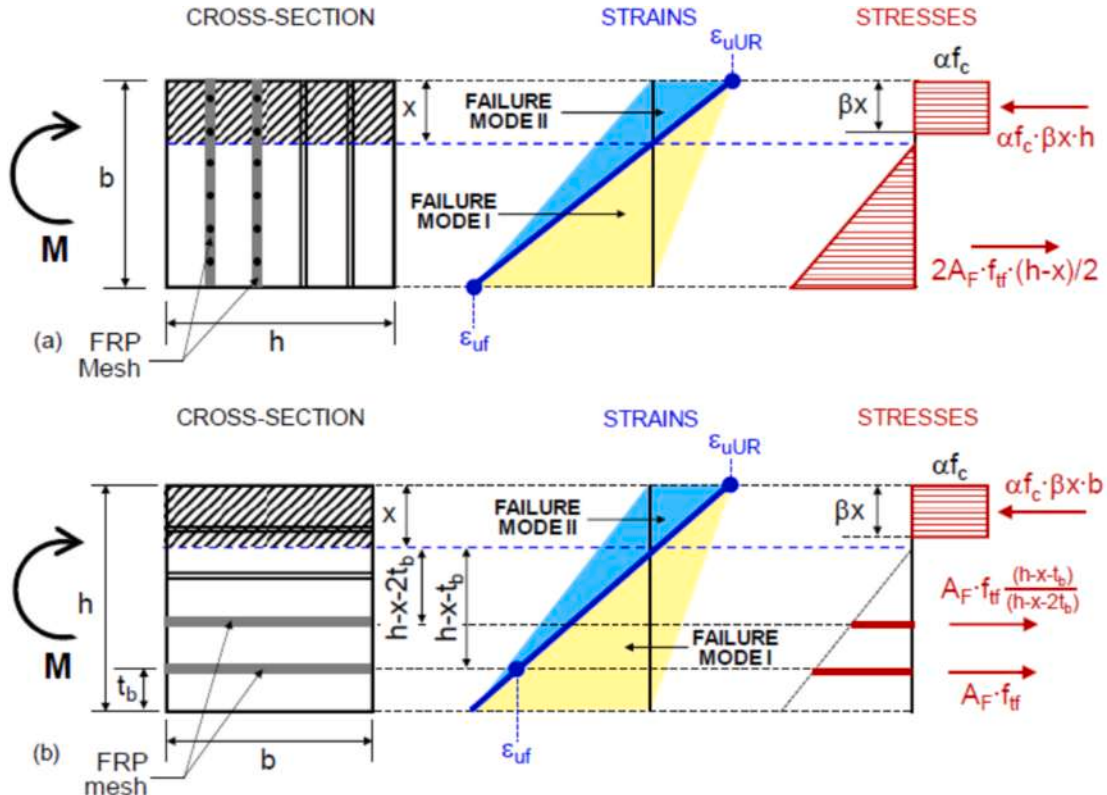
Cross-section of a masonry crowning beam reinforced with FRP mesh in two bed joints, and strain and stress profiles, under horizontal bending (out-of-plane loads, a) and vertical bending (in-plane loads, b), for calculating the resisting bending moment under the hypothesis of tensile rupture of the fibres. Neutral axis position at balanced failure.
